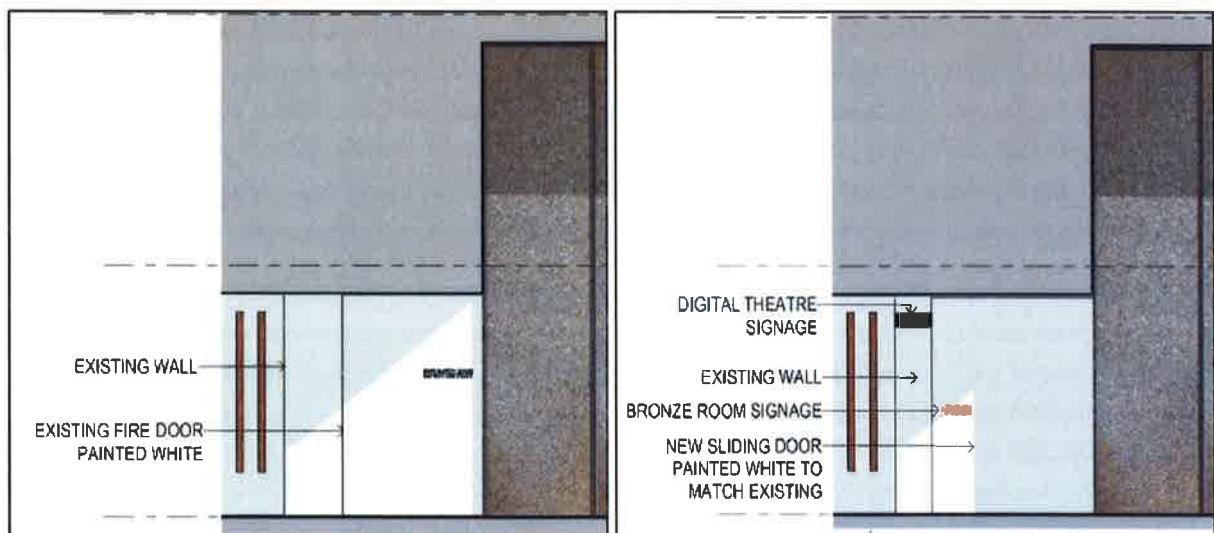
| Existing (left) and proposed (right) door to Bennelong Passage (Source: Architectural Drawings)
